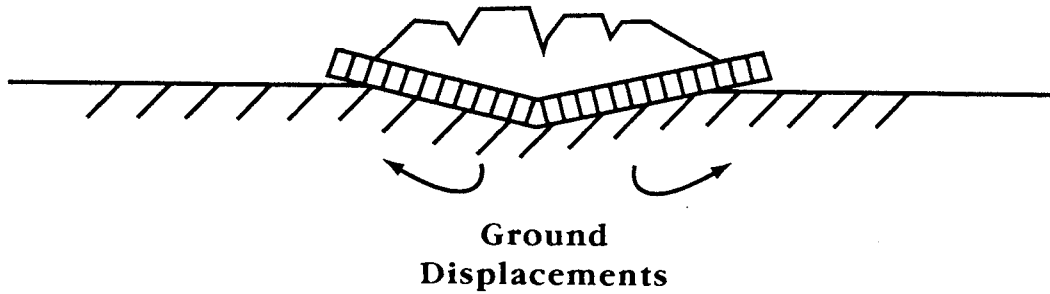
Schematic Diagram of Embankment Penetration into Foundation and Consequent Culvert Damage
